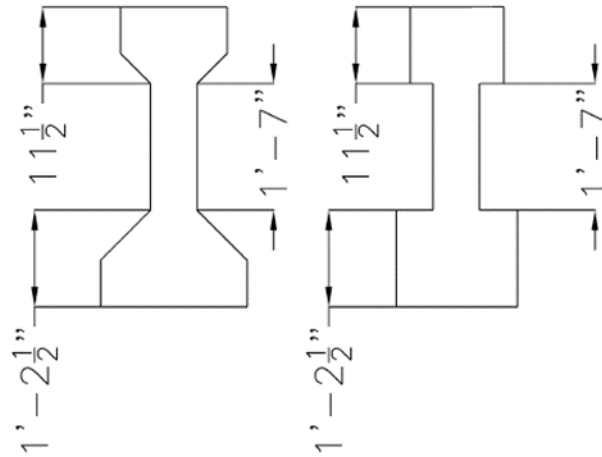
Type-III girder section and the equivalent section used to determine properties
